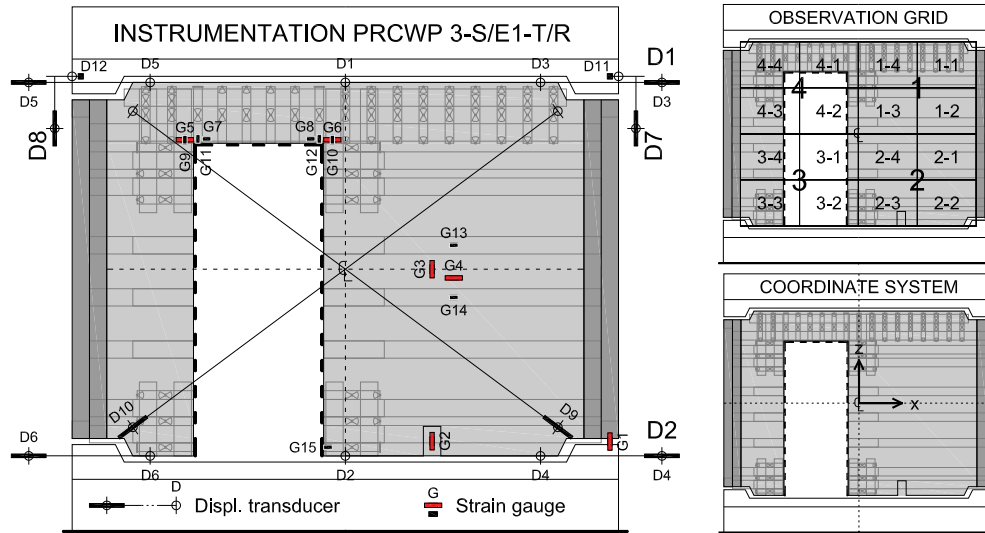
Instrumentation layout of specimen PRCWP 3-S/E1-T/R
